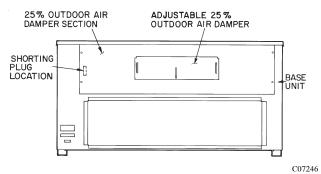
Standard 25% Outdoor-Air Section Details (13 to 25 Ton Units)
